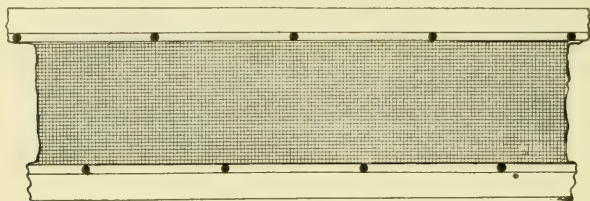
Narrow avenue, showing trees planted alternately about 45 feet apart.
